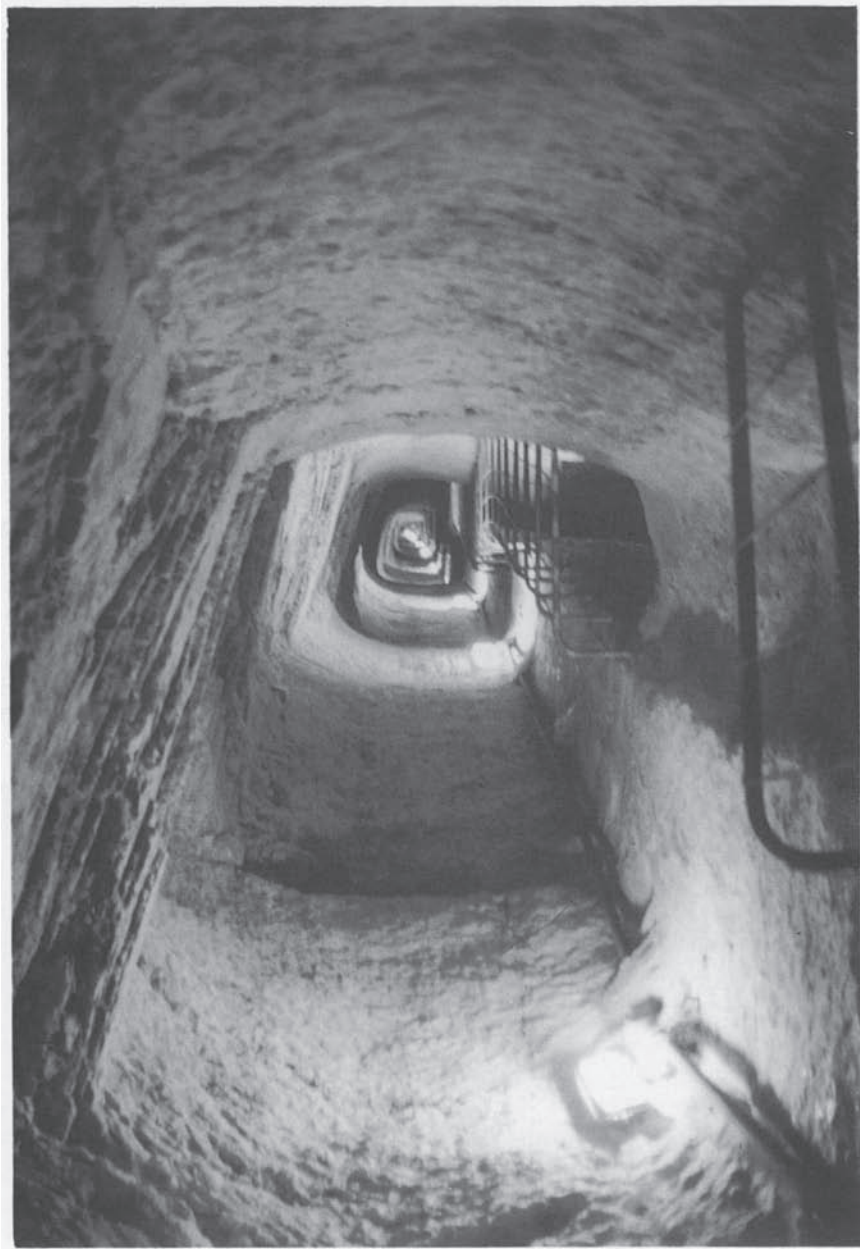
Eupalinos' tunnel (southern section looking north).
